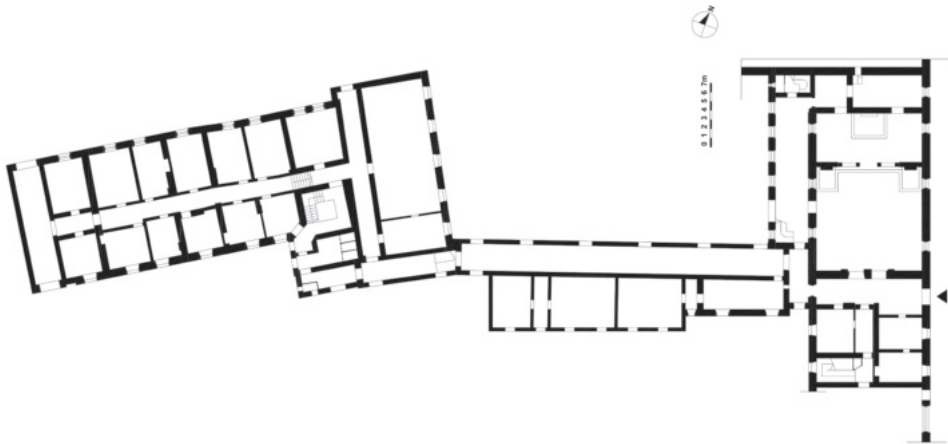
Floor plan of the layout of the Cracow Resurrectionist House together with the Resurrectionist Church.
